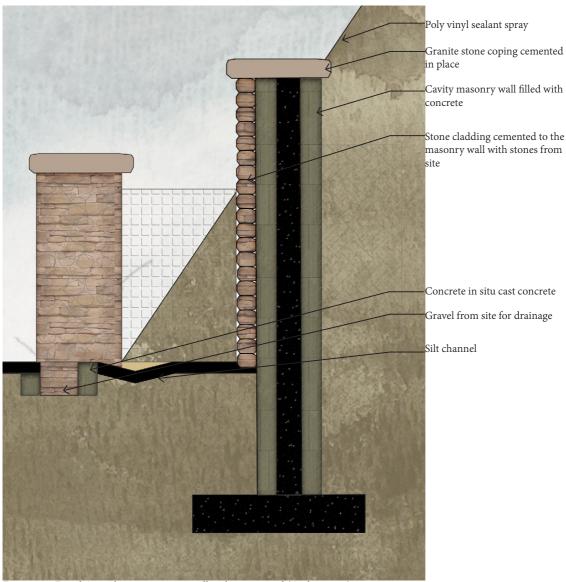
20 Detail A1 scale 1:20: retaining wall with mentis grid (Author 2017)
